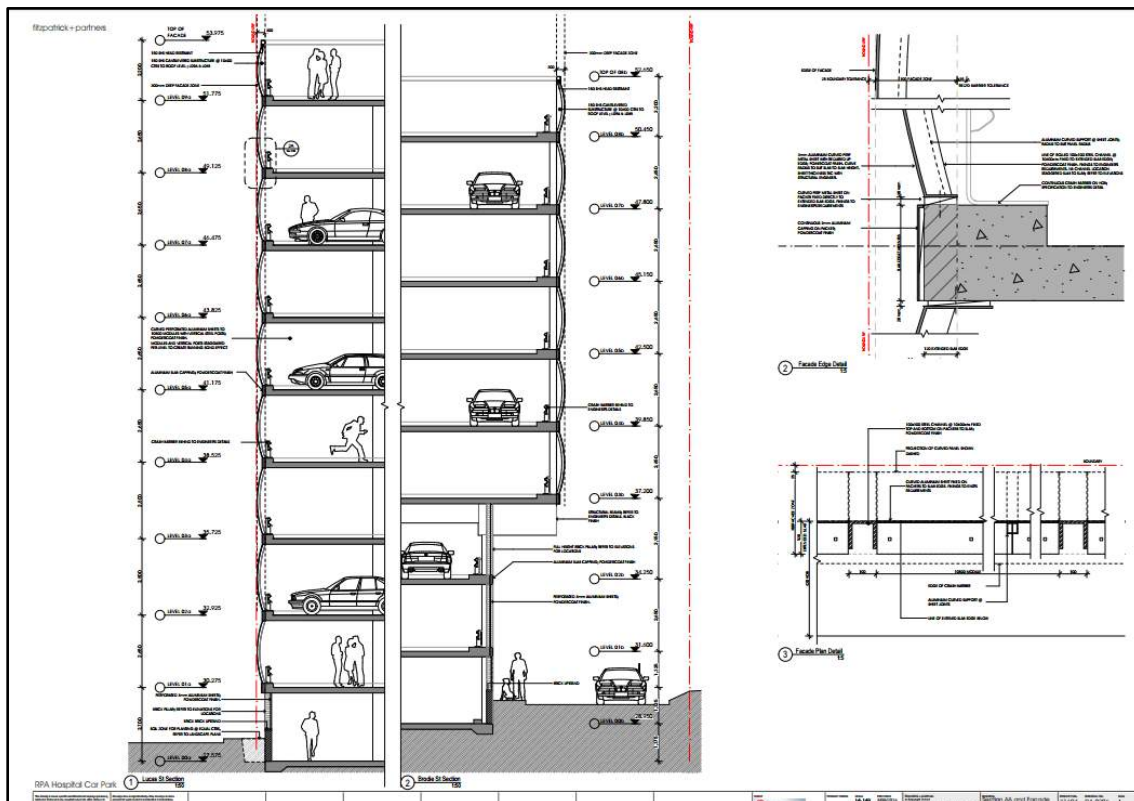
DA-0206- Façade Section and Details (Source: Fitzpatrick + Partners, 05.05.2016).
